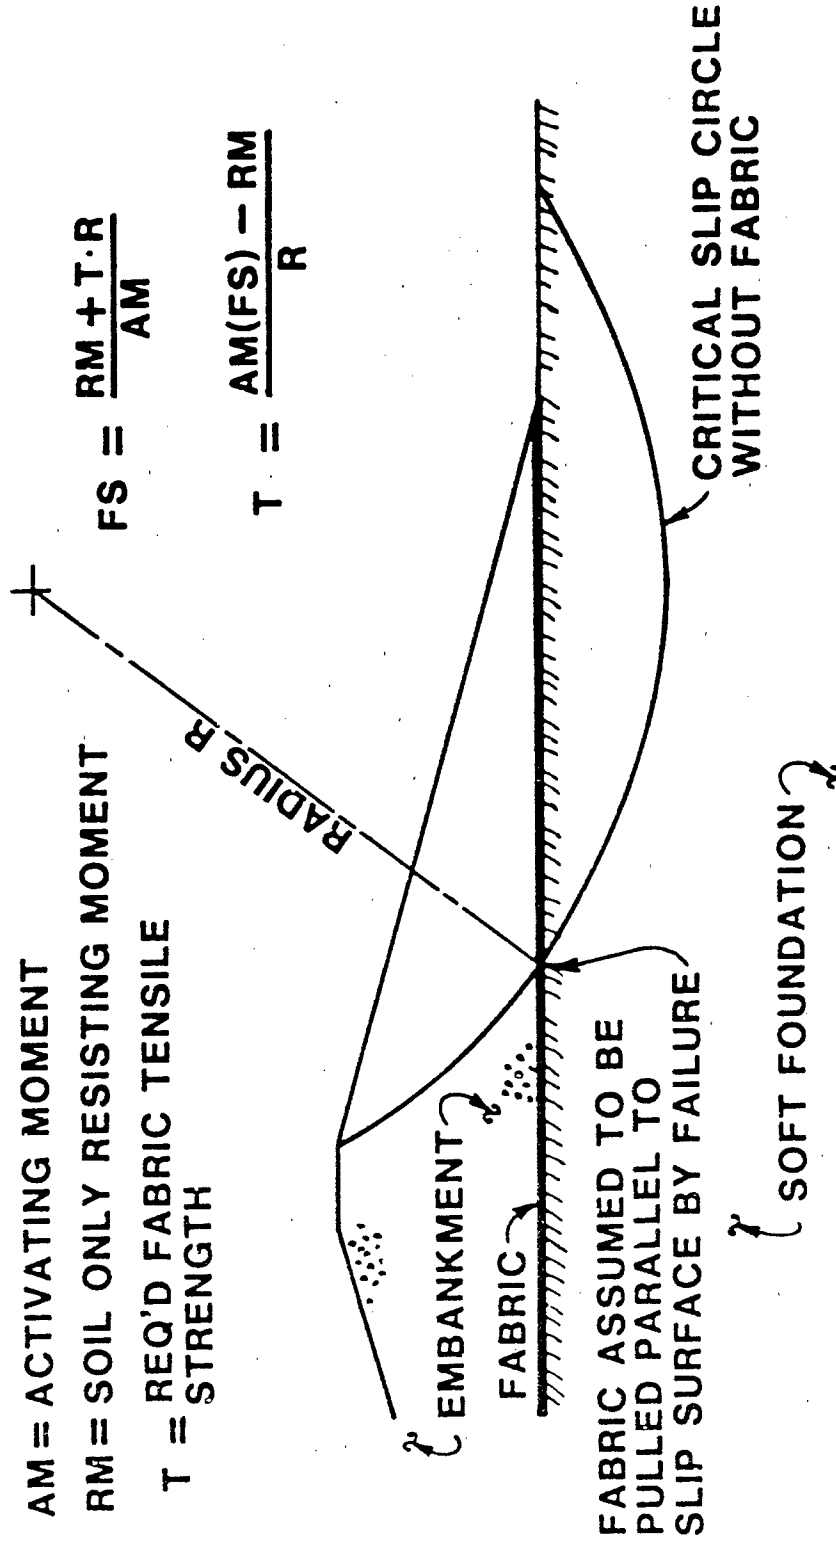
Concept Used for Determining Fabric Tensile Strength Necessary to Prevent Slope Failure
